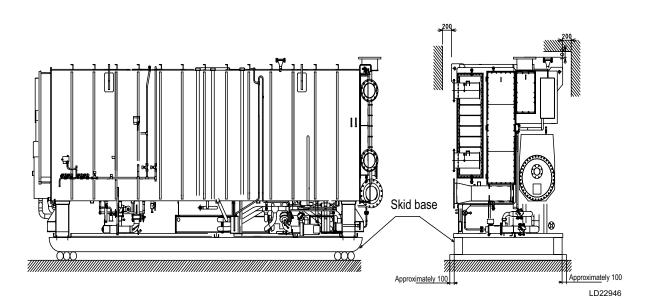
MOVING THE MACHINE ON ROLLERS
